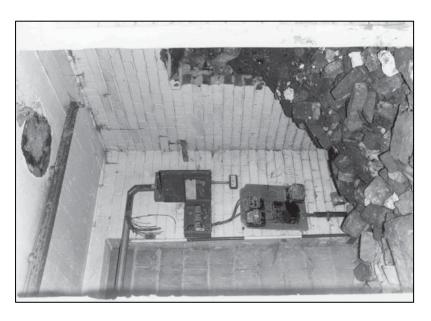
Building A, GF SE corner room, looking E (photo 9/1) (top to left).
